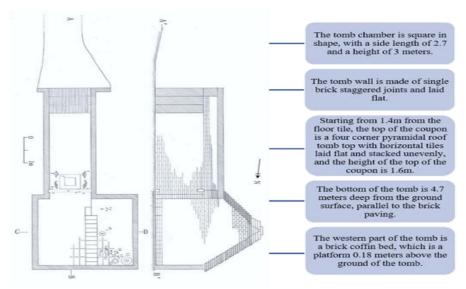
Floor Plan of Tomb No. 6 in Baizhuang, Jiaozuo
